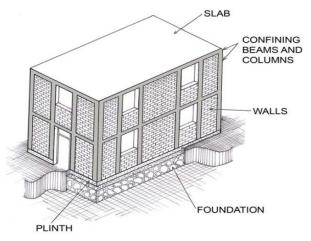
A typical Confined Masonry building of two-story [Blondet,2005]
